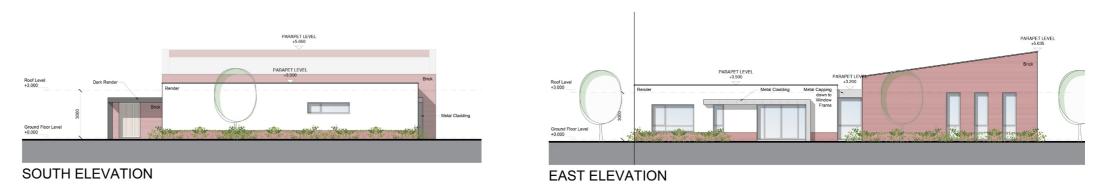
Red brick and pale render finishes applied to crèche and community building buildings.
